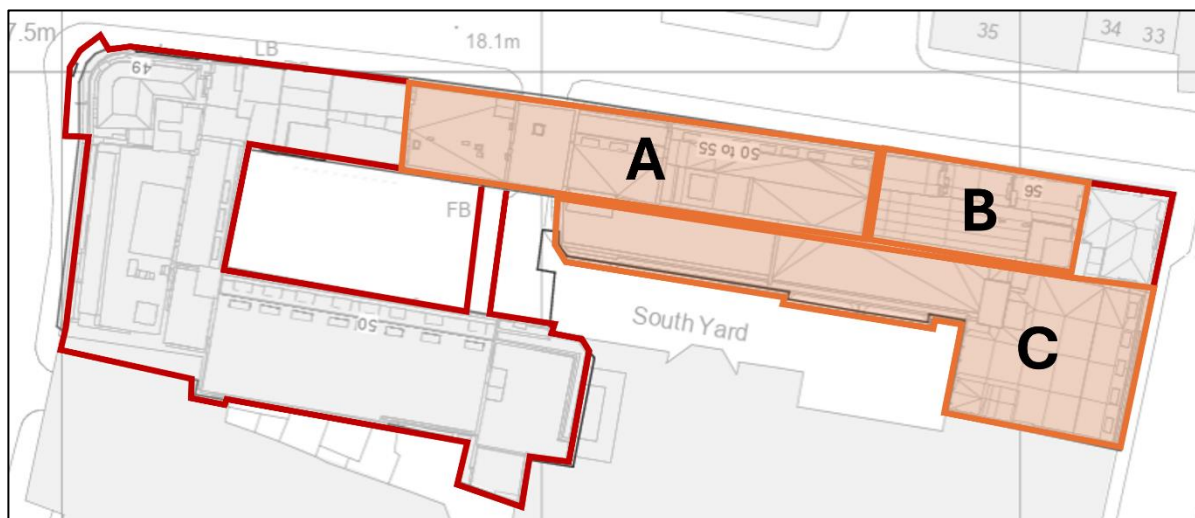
A) Entrance Wing, B) Nos.53, 54 & 55 Chiswell Street “The Cottages” & C) Whitbread Brewery Building’s Milton Street “The Stables” & “D Block”
